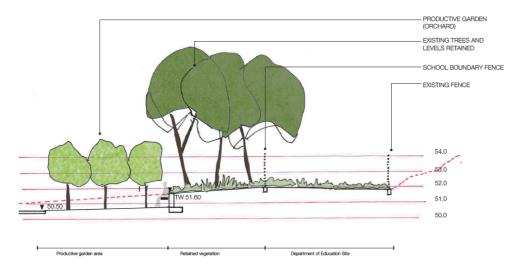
Section detail showing retaining walls on eastern boundary Source: Group GSA
